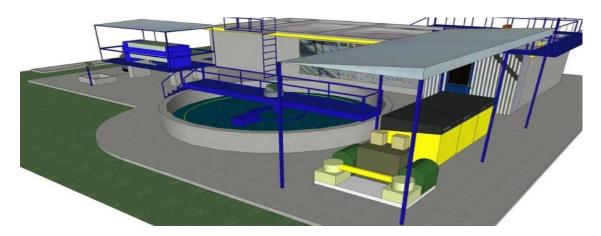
B 3D Model Of Sewage Treatment Plant
